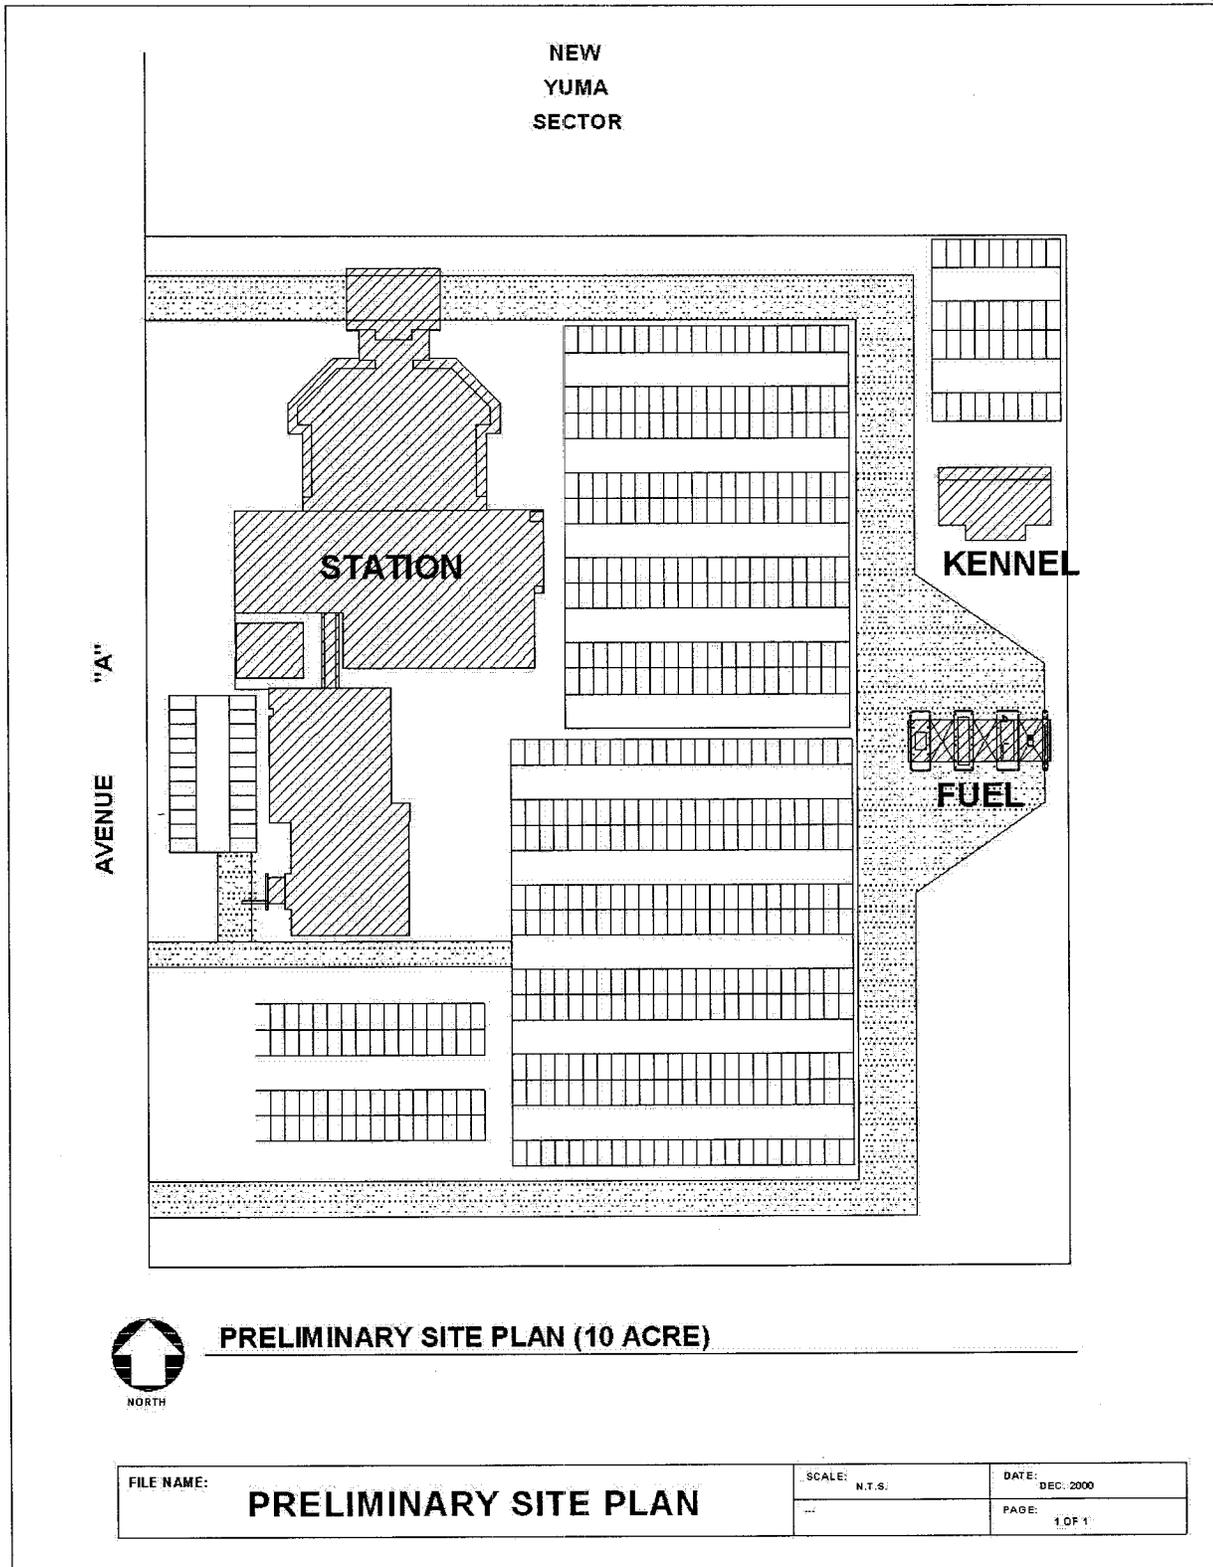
Preliminary Site Plan for Border Patrol Station
